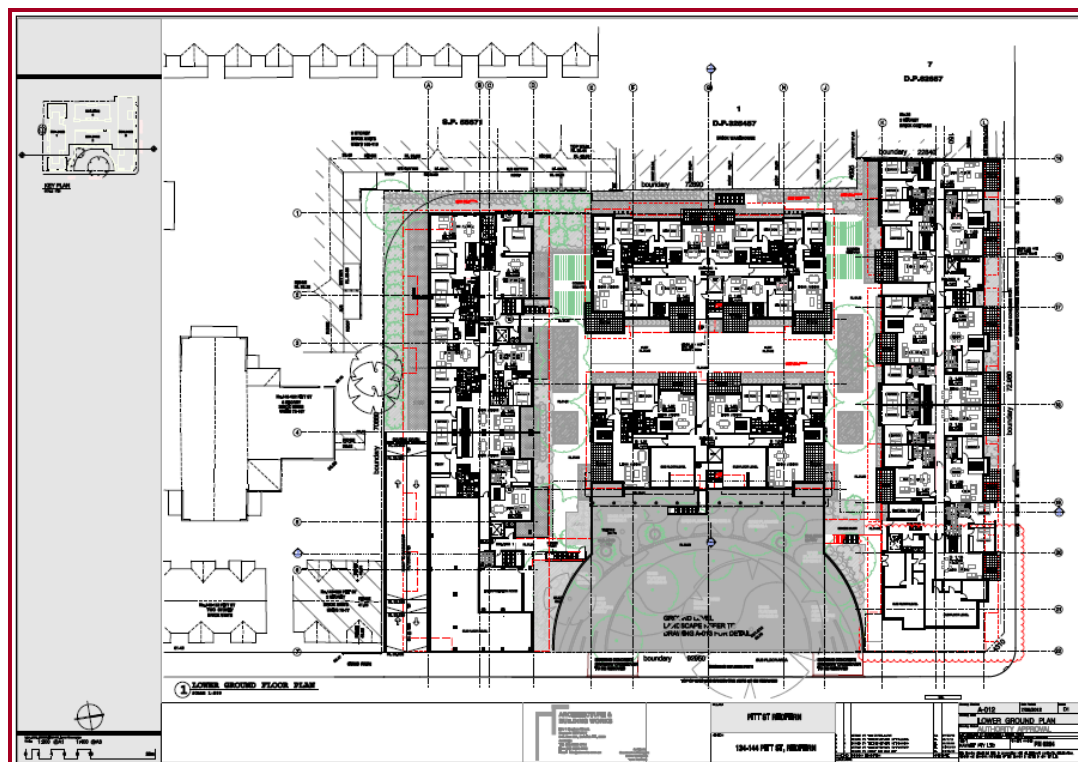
Plan of the proposed lower ground floor at the subject site (Source ABC Planning Pty Ltd 'A-012 Lower Ground Floor Level').
